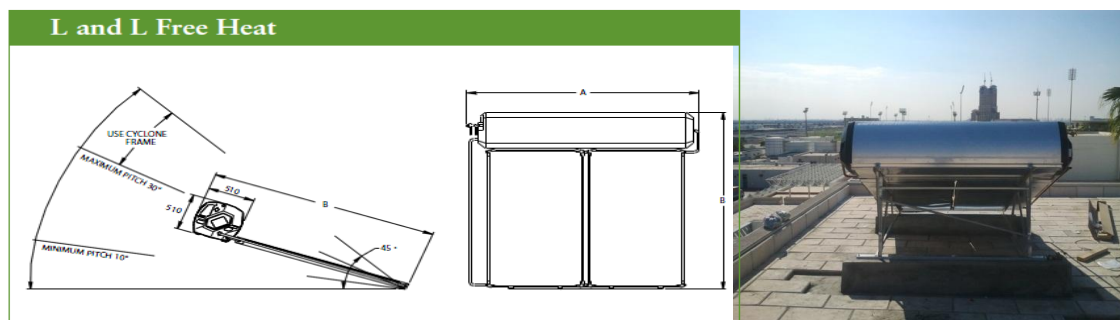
Solar Thermal Collector installed on the roof of Latifa Hospital, Dubai.
